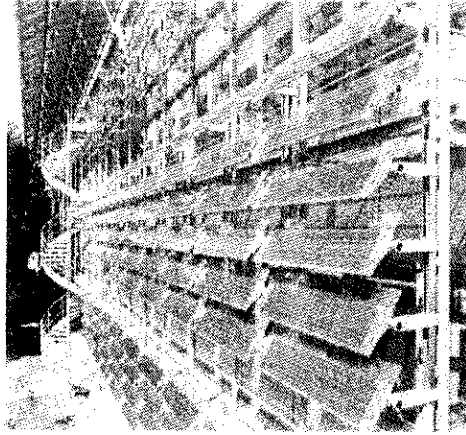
Facade shading system of Building 21, made by horizontal louvers and structural supports.
